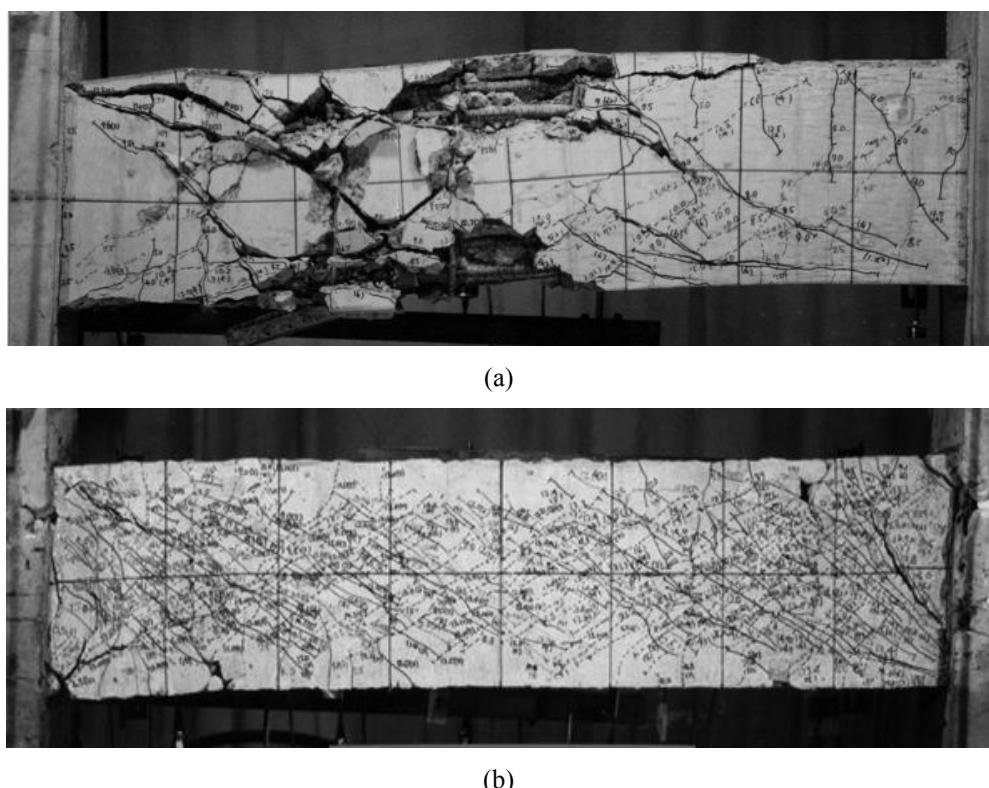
Damage level of (a) standard R/C member, and (b) R/ECC member, showing the suppression of bond splitting and cover spalling (Fukuyama et al., 2000)
